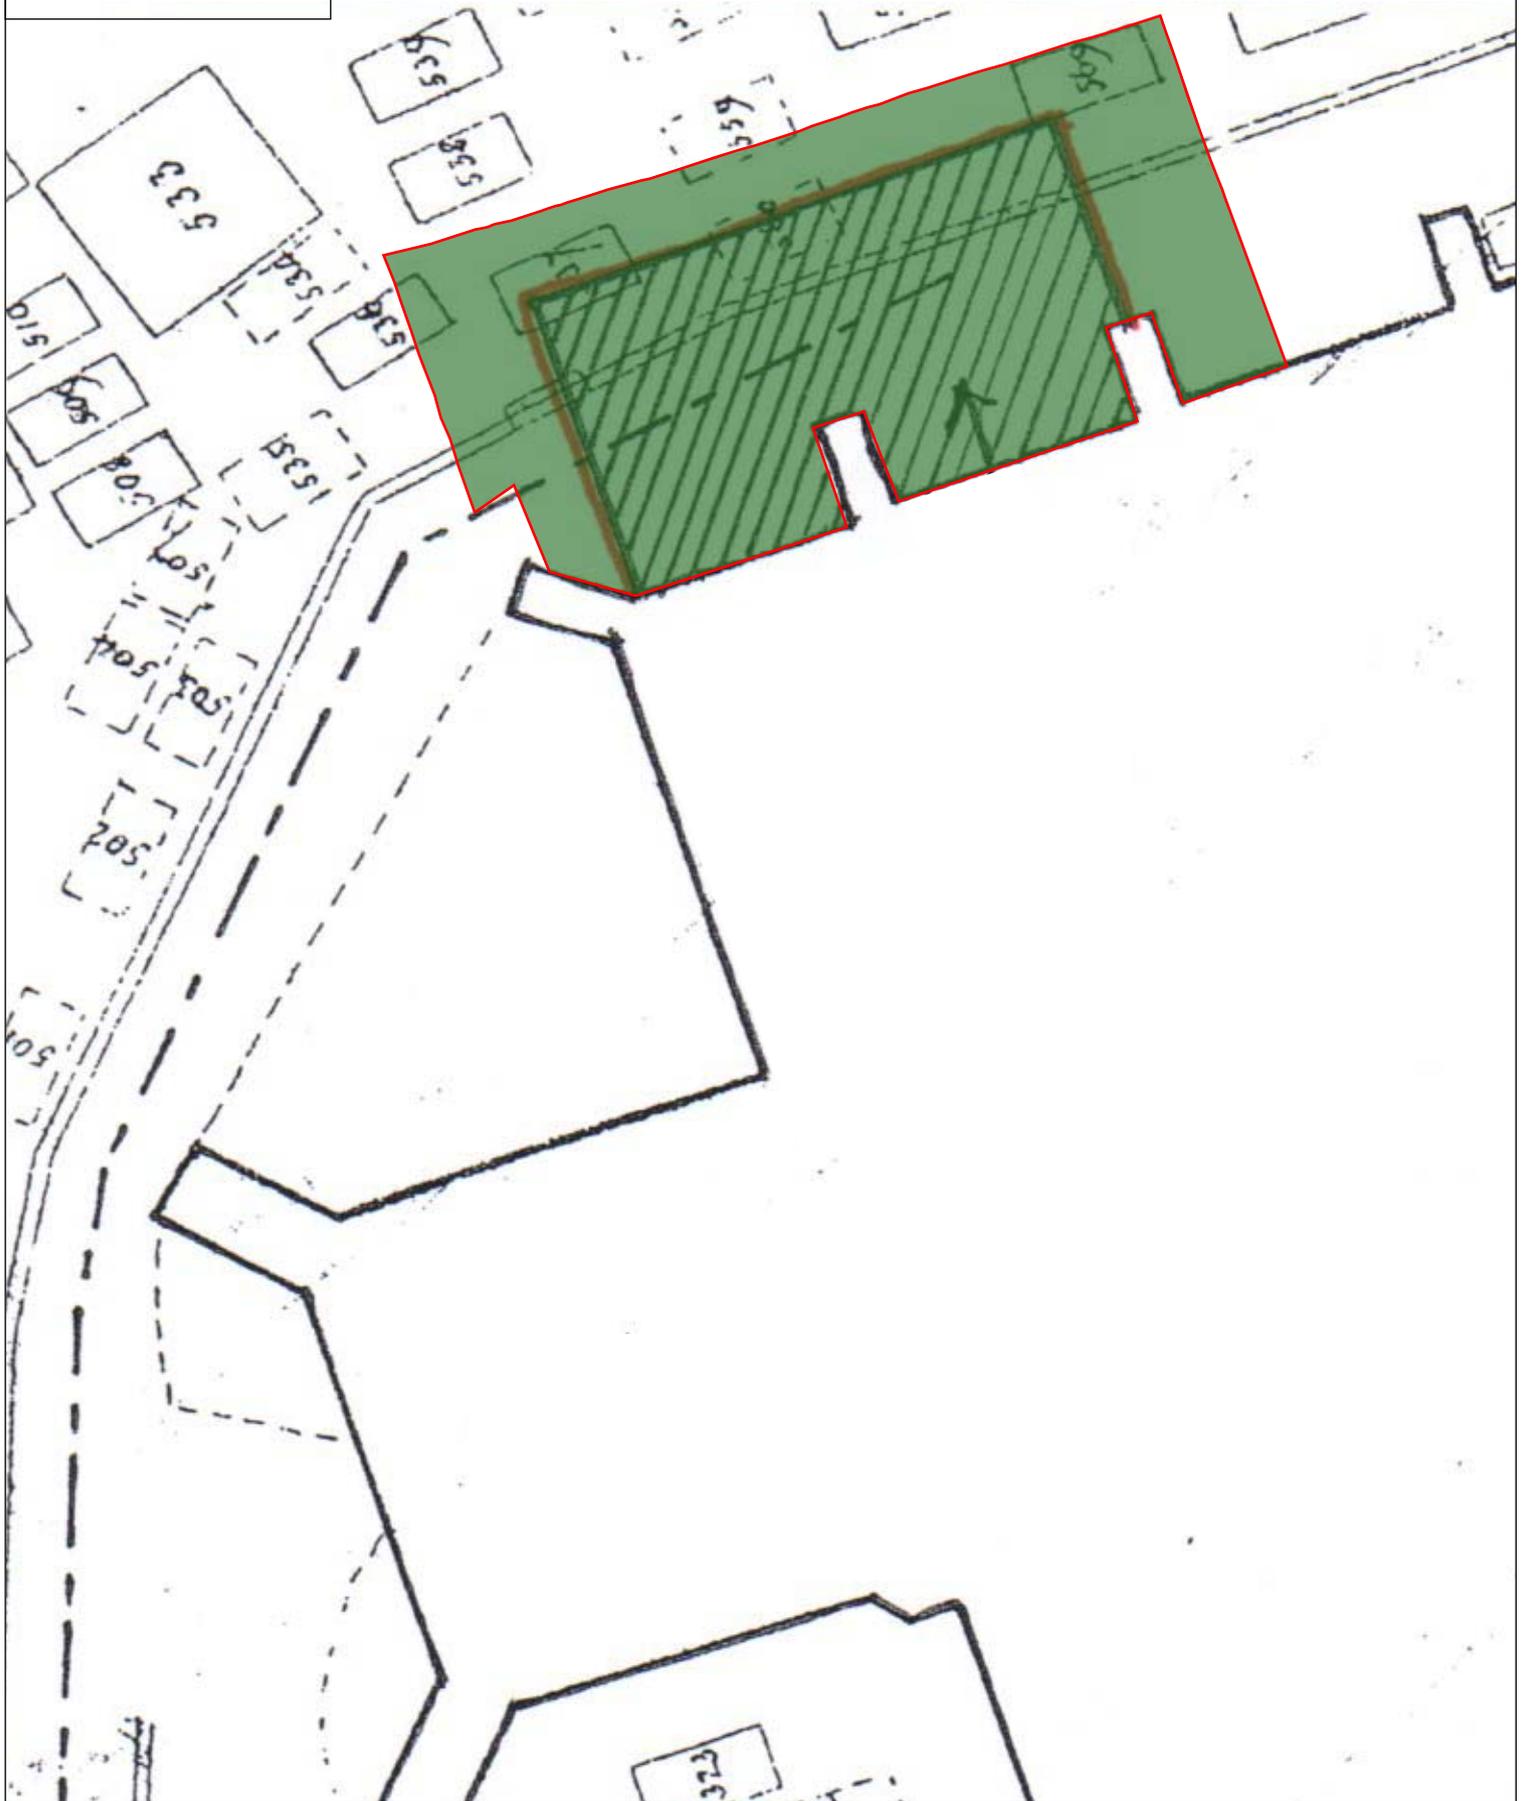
Location of extension footprint at St Oswald's Church, Malpas overlain on the 1884 Graveyard Plan. Scale 1:100 at A4.
